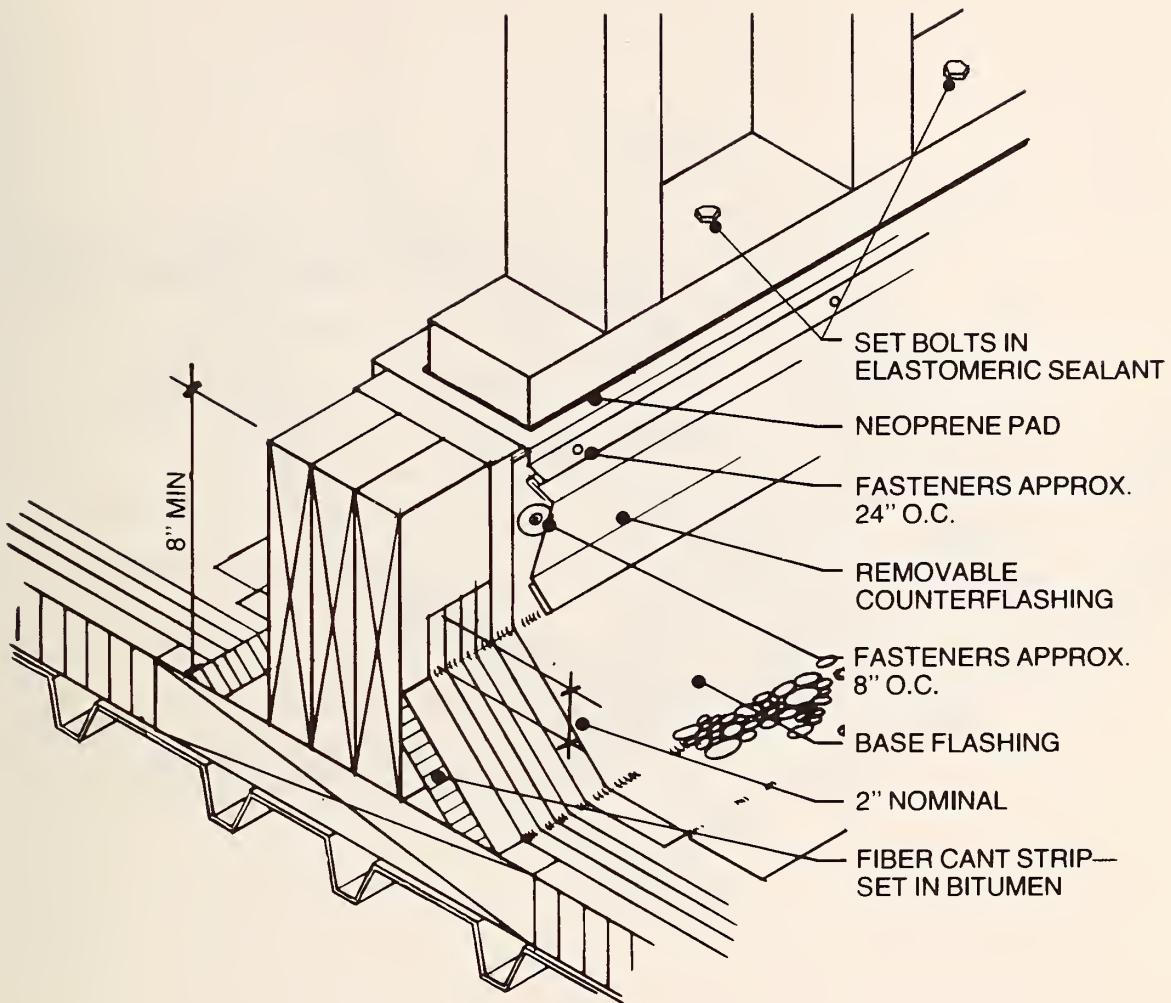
Detail of Column Support for Collector Frame on Steel Structural Member of Building
